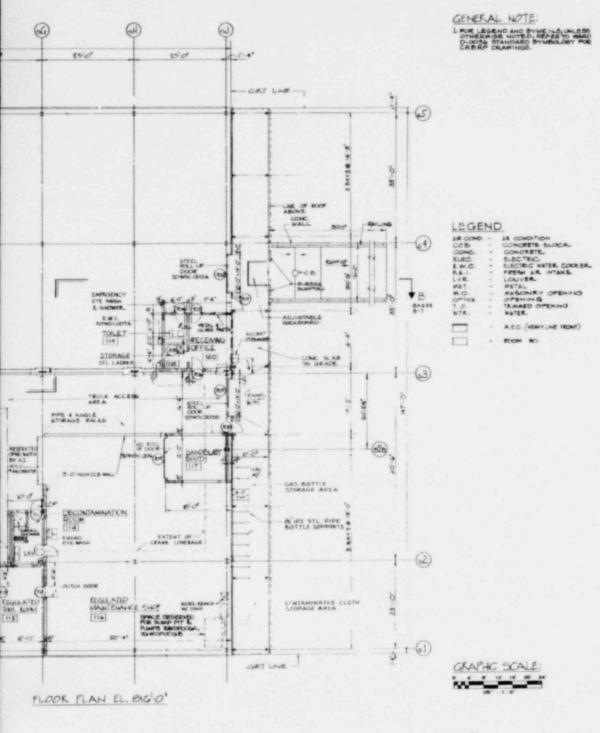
General Arrangement Plant Service Building Floor Plan El. 816'-0"
